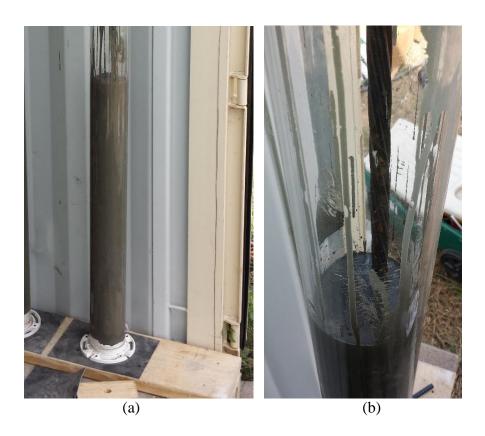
Wick-Induced Bleed Test Setup: (a) Full View, (b) Close-Up
